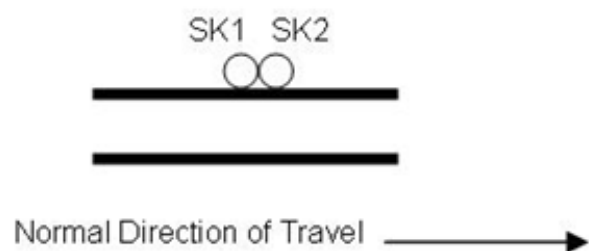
Typical Layout of Single Rail Contact Type (SK11 Heads)
